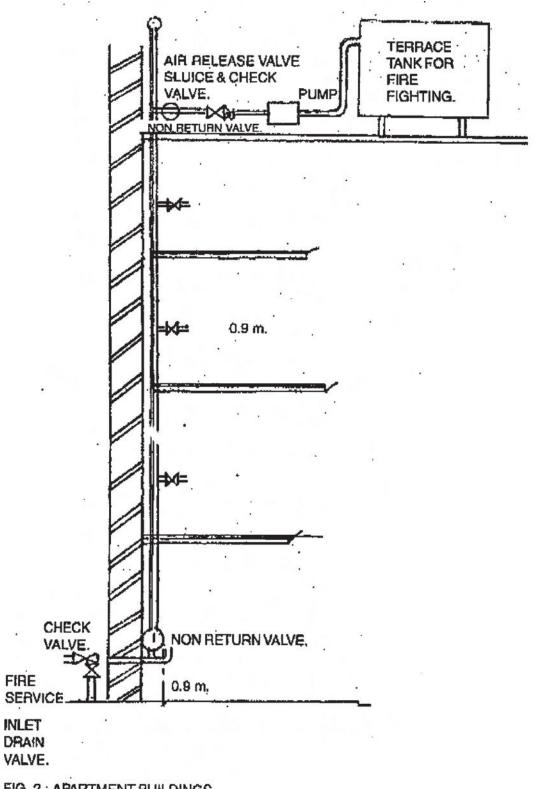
APARTMENT BUILDINGS EXCEEDING 16 m.
